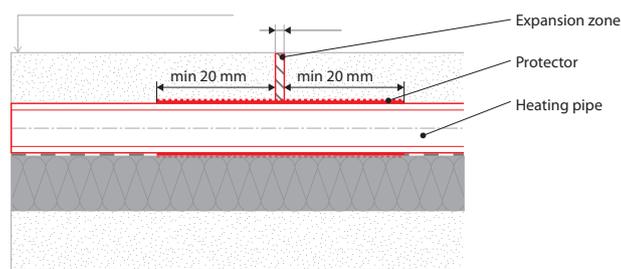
Expansion joint of heating screed when laying soft floor coverings (PVC, linoleum, carpet)
